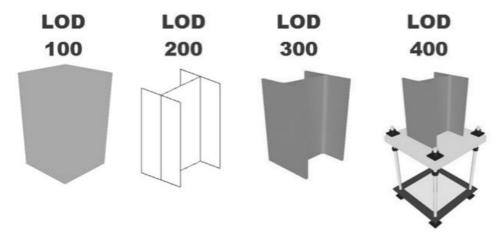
Levels of development (adopted from Building Design + Construction, 2018)
